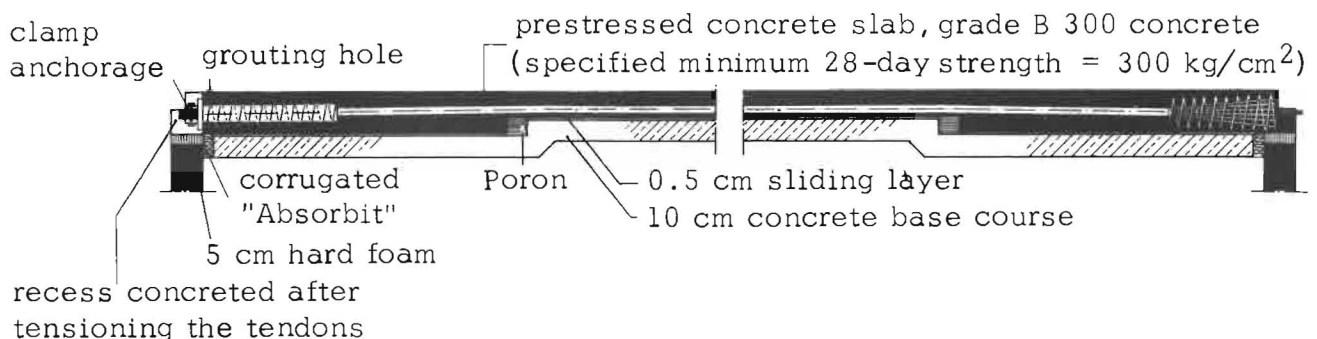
Television studio at Frankfurt-on-Main. Section through the floor.
